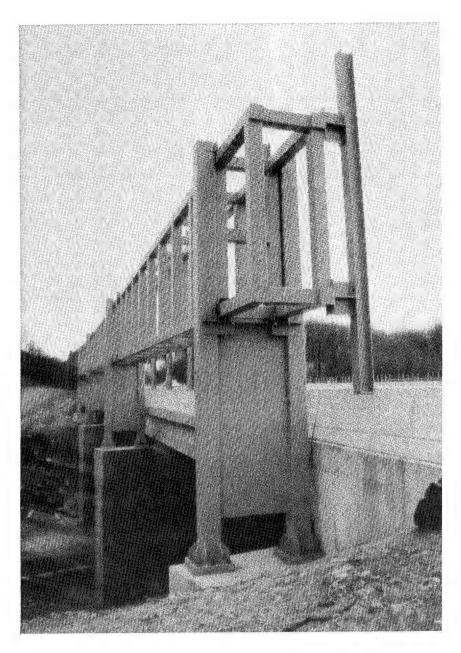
Concrete and steel structure used to support precast concrete panels along bridges on New Jersey Interstate Route 80 (from Guzaltan 1992)
